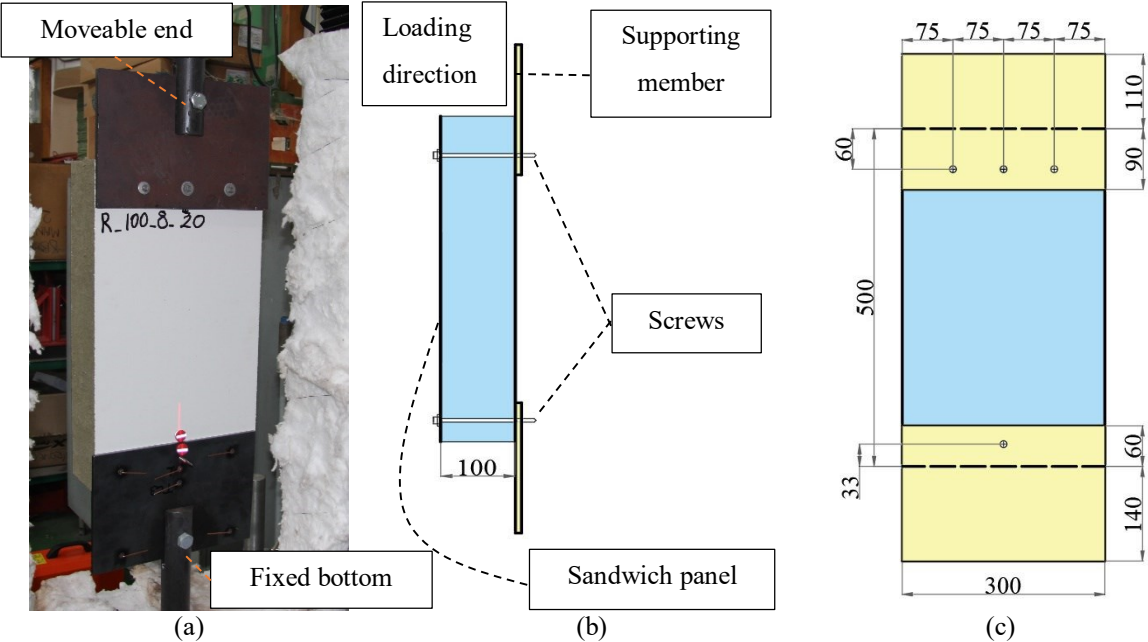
Experimental arrangement of panels in translational tests, a) test [8], b) section view, c) front view, dimensions in mm
